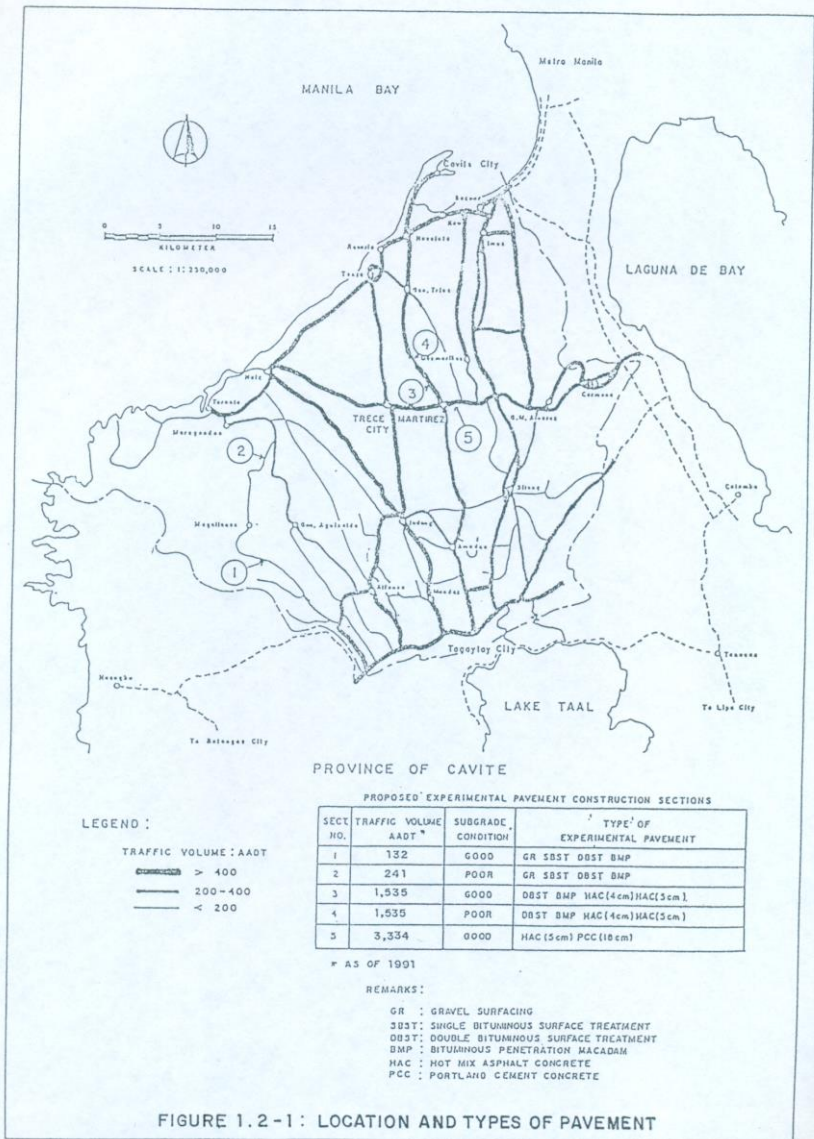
LOCATION AND TYPES OF PAVEMENT
